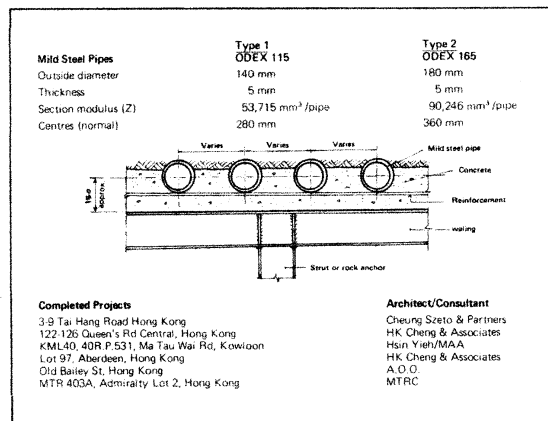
ODEX pipe pile retaining wall system (Franki PSC Ltd. Technical Publication)
